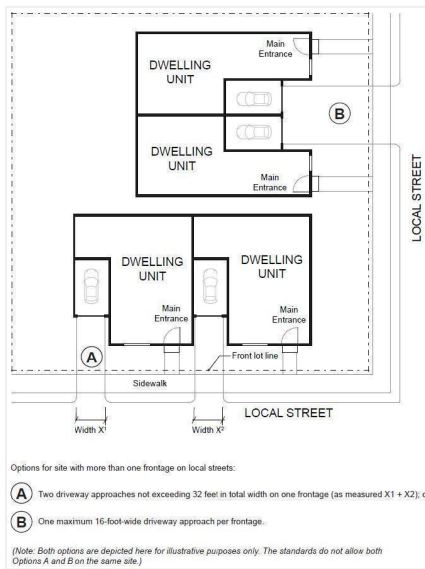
f Driveway Approach Width and Separation on Local Street
